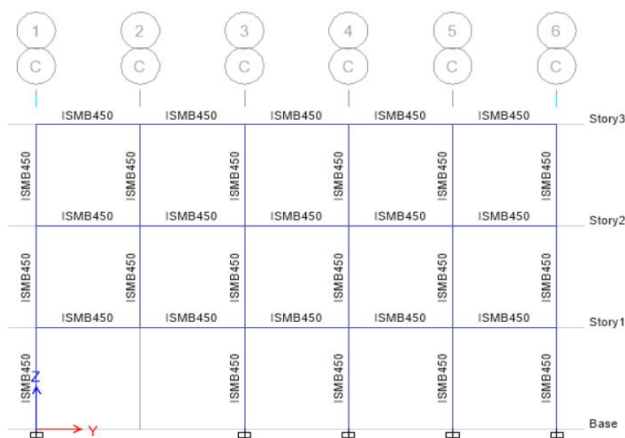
Elevation View of a Three Storied L Shaped Building with External Floating Column without Bracing
